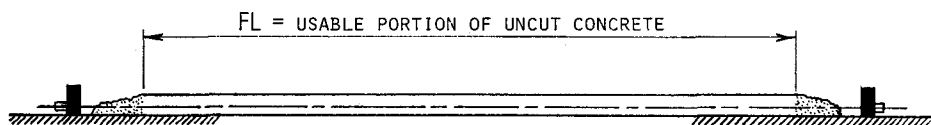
Longitudinal section through extruded slab with one usable (uncut) portion of concrete.
